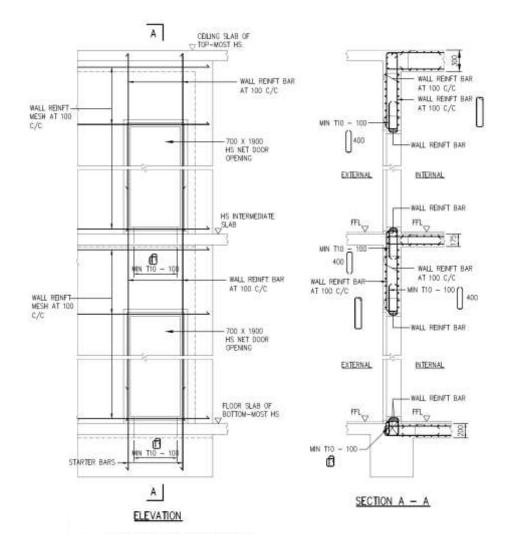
STEEL REINFORCEMENT BAR DETAIL FOR HS, SS SND SSS DOOR OPENING
